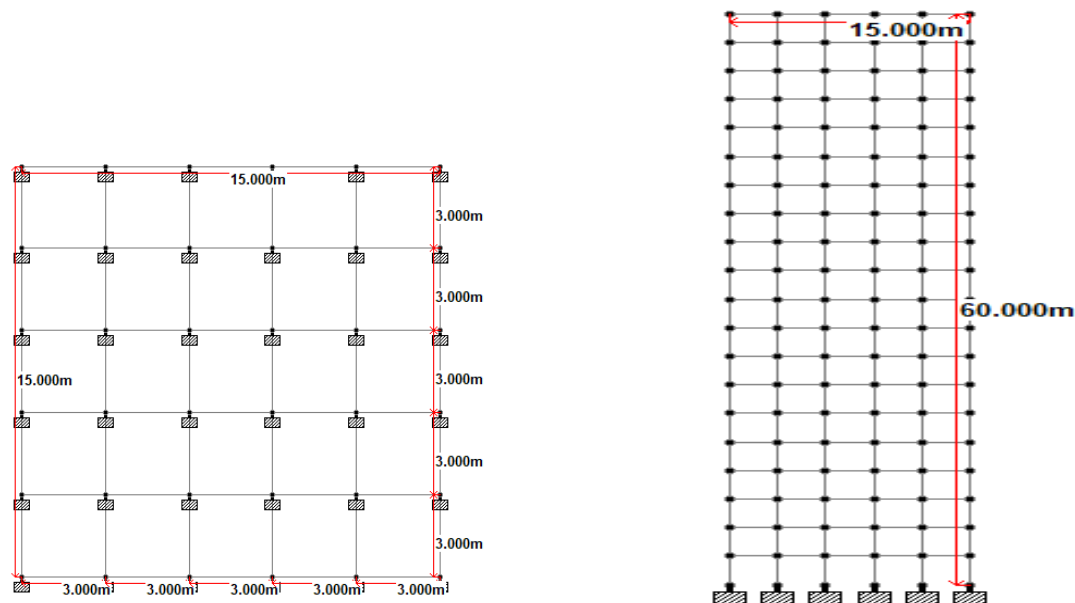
Plan of Conventional structure Figure 2. Height of the structure
